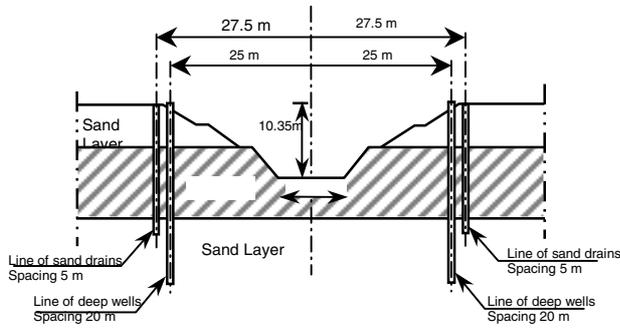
Excavation configuration required for construction of the typical culvert sectors.
